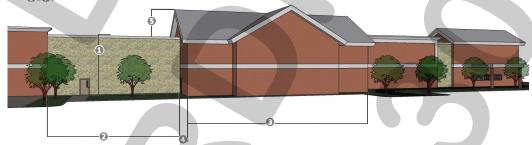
COMMERCIAL BUILDING ARTICULATION STANDARDS
